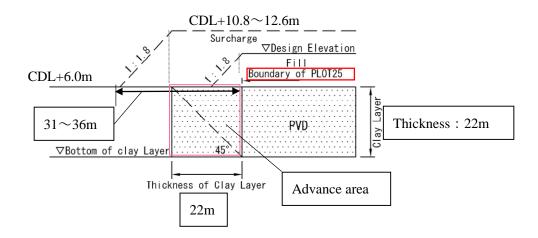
Concept of Soil Improvement considering advanced improvement area
